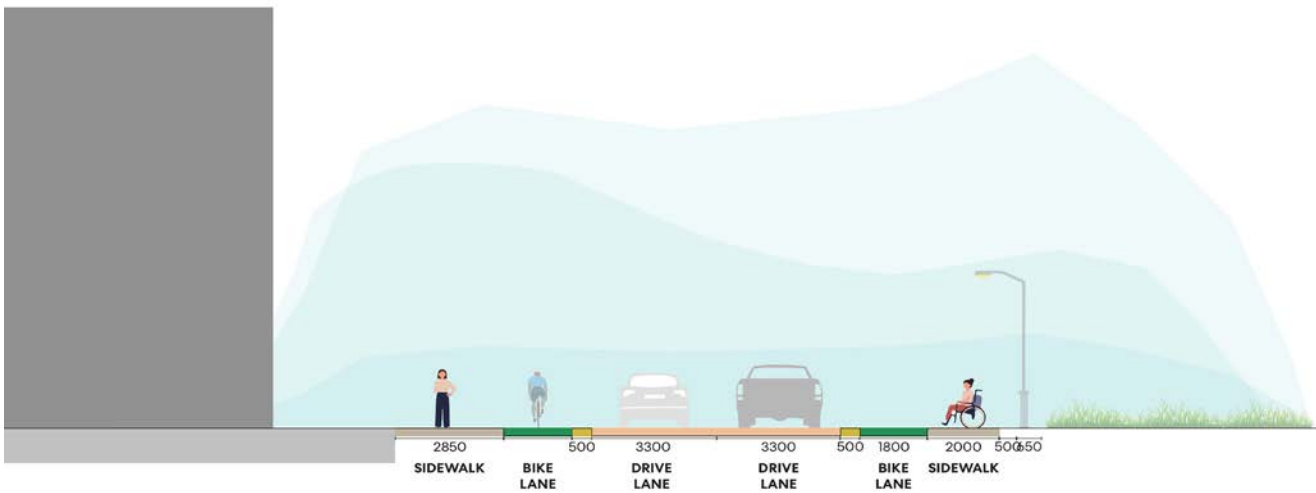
Cross Section showing Huron Drive at South Valley Parking lot – Proposed
